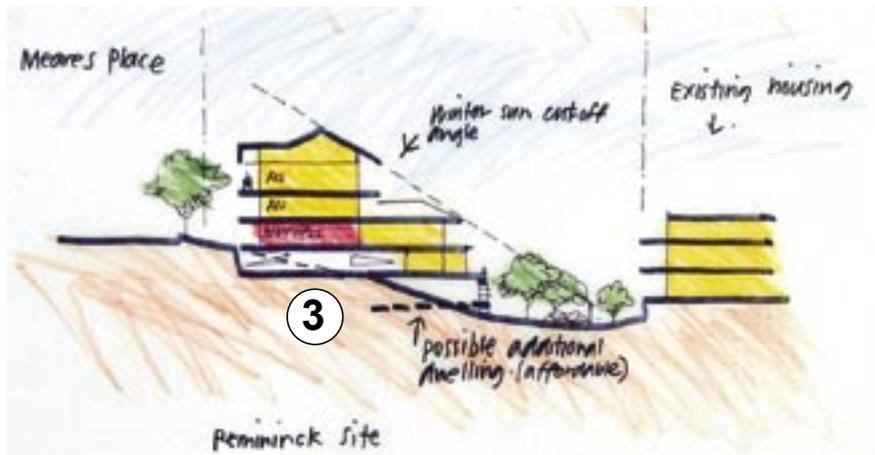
Site section through the Reminic property (see '3' on plan above), showing how this property might be developed with four storeys, and so that it does not overshadow the adjoining existing apartments down the hill (this section corresponds with the photo of this site (Figure 60))
